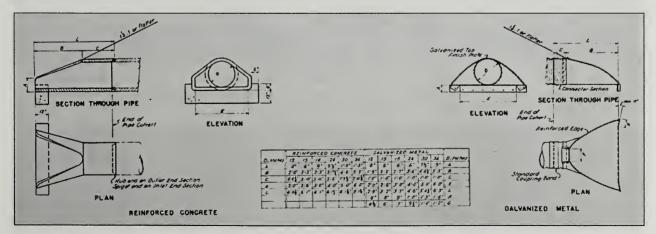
Portion of drawing showing concrete and galvanized metal inlets and outlets from the Schooner Head Overlook Access Road project. (U.S. Department of Commerce, Bureau of Public Roads, Project 22A1, Sheet 7 of 12, May 1957)
